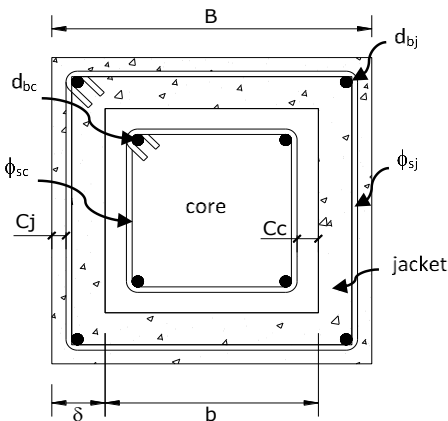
Geometry of RC section reinforced with a reinforced concrete jacket
